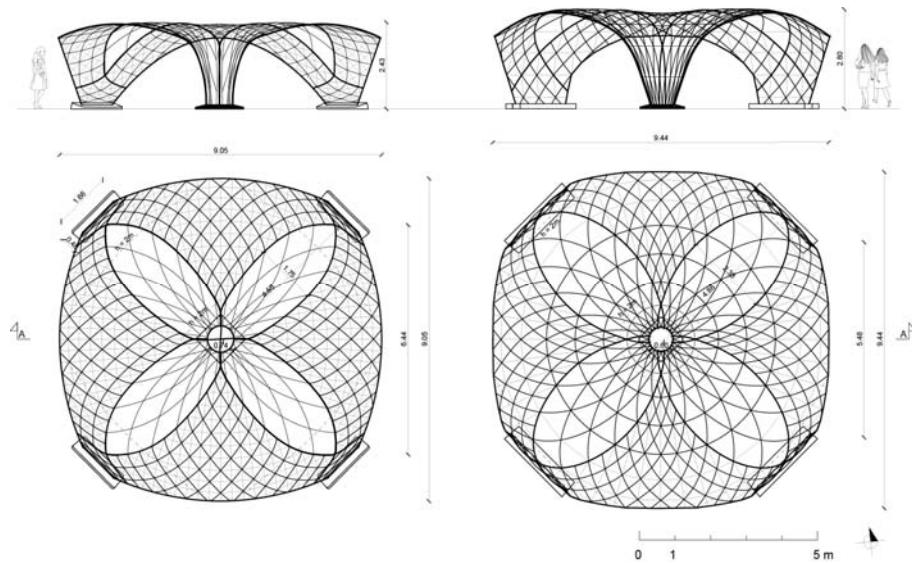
Sections and plans for the preliminary (left) and final (right) design.
